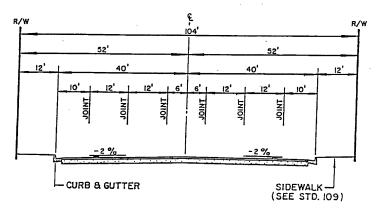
(2 OF 5): EAST VALLEY SPECIFIC PLAN ROADWAY CROSS-SECTION
